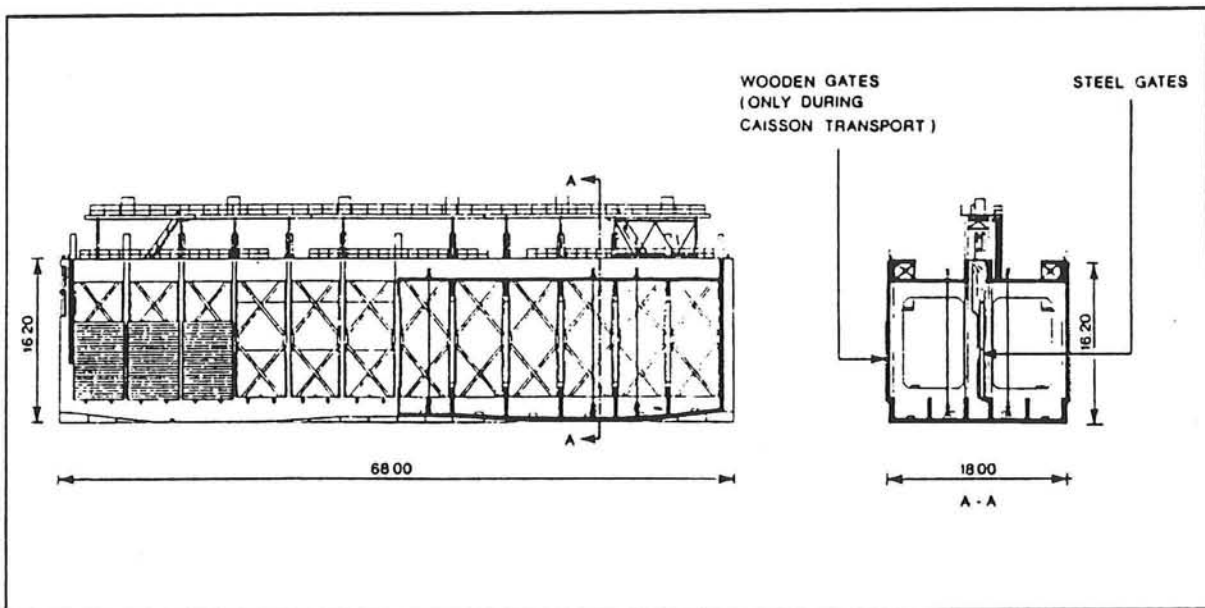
An example of a sluice-caisson used in the dutch Delta works
